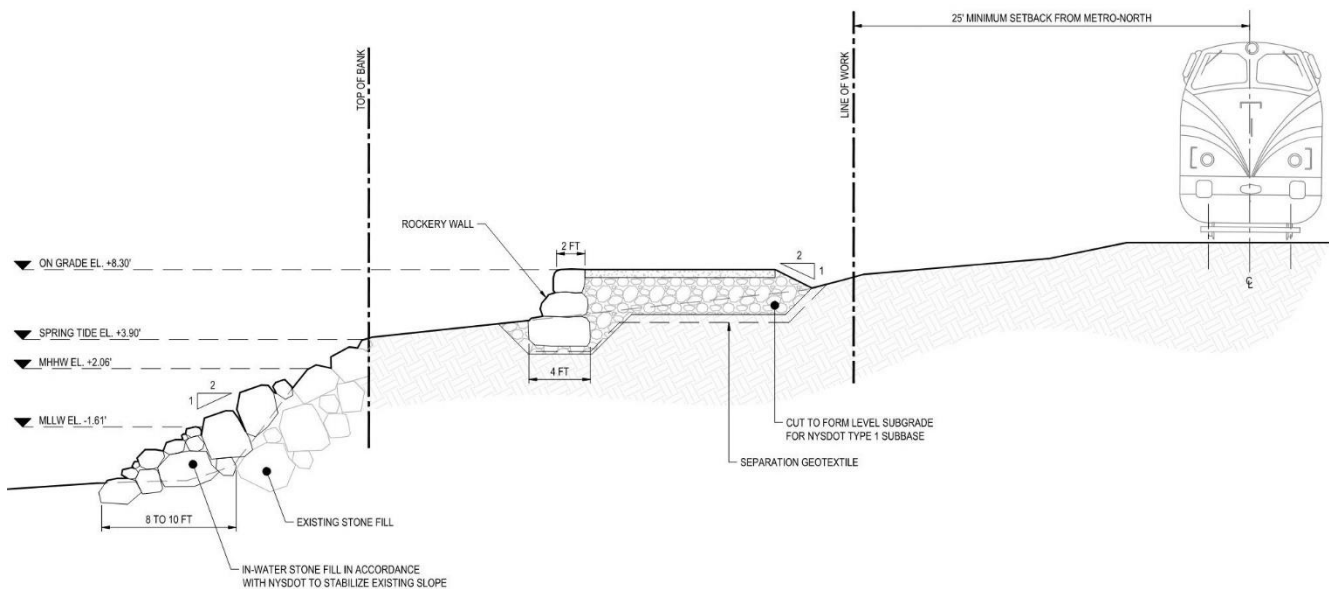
Typical on-grade section showing in-water fill to stabilize existing slope
